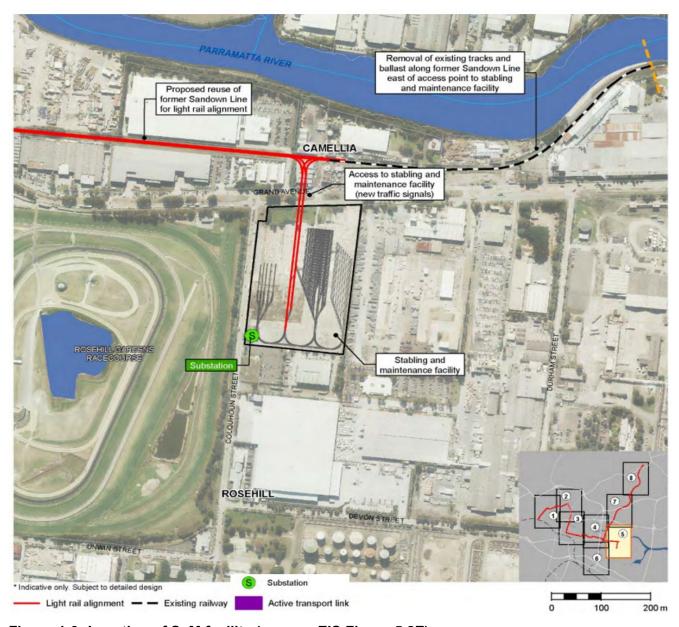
Location of SaM facility (source: EIS Figure 5.2E)
